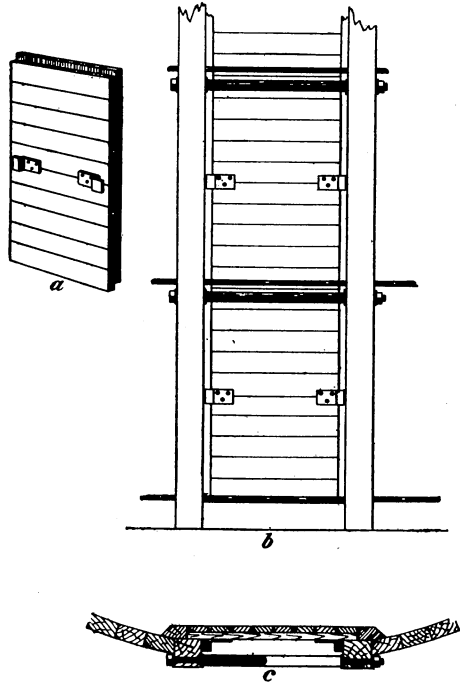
A continuous door: *a*, A section of the door; *b*, doorframe with door in position; *c*, cross section showing door and frame.
